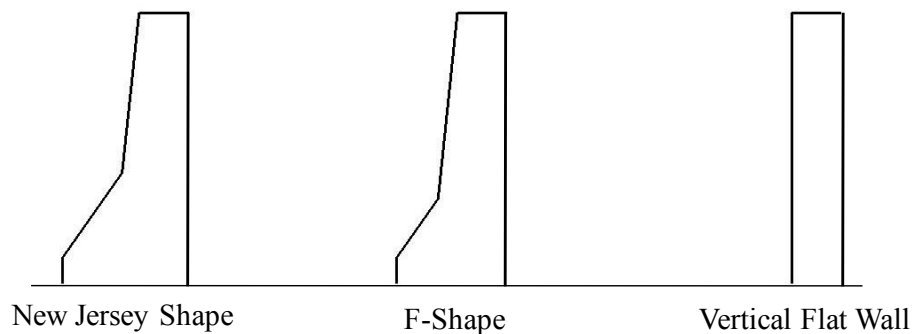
Typical Cross Sections for the Concrete Barrier Types Considered
